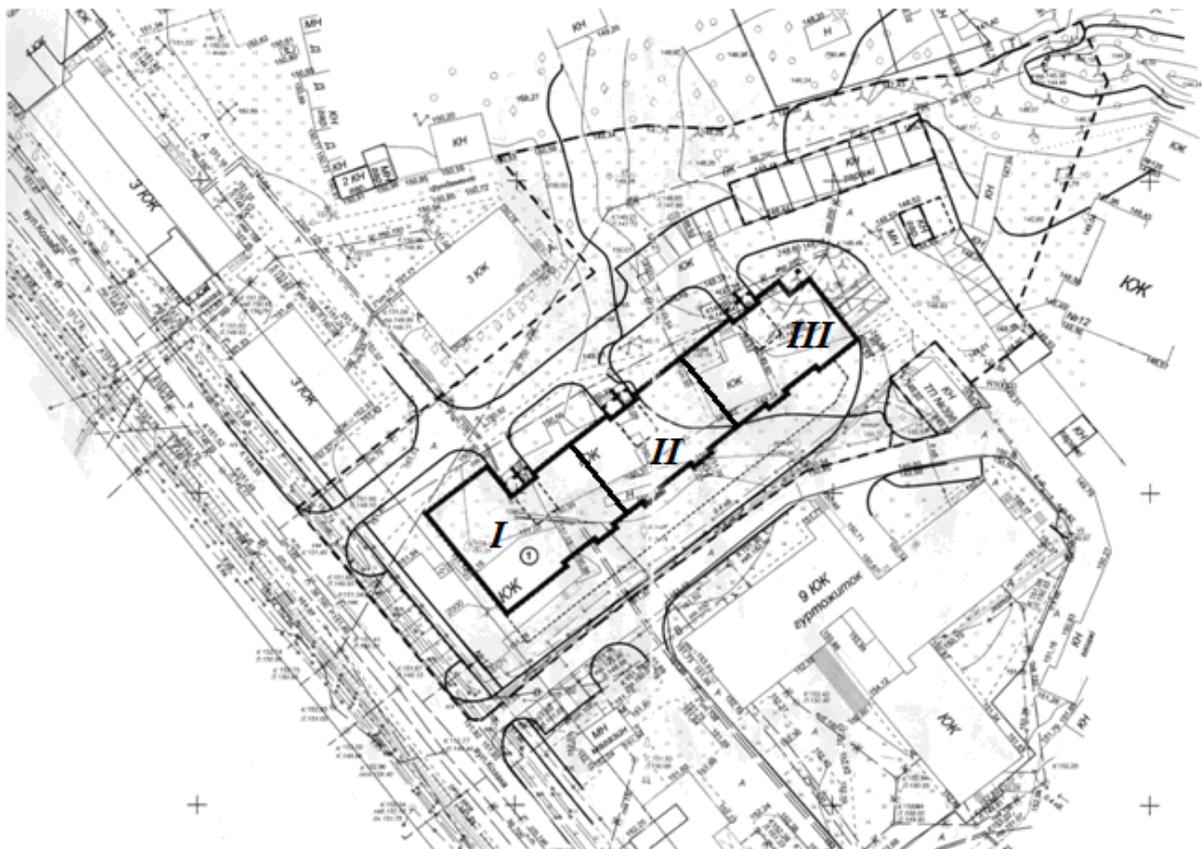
The site of the three-sectioned nine-ten storey house on the str. V. Kozak, 14 in Poltava
